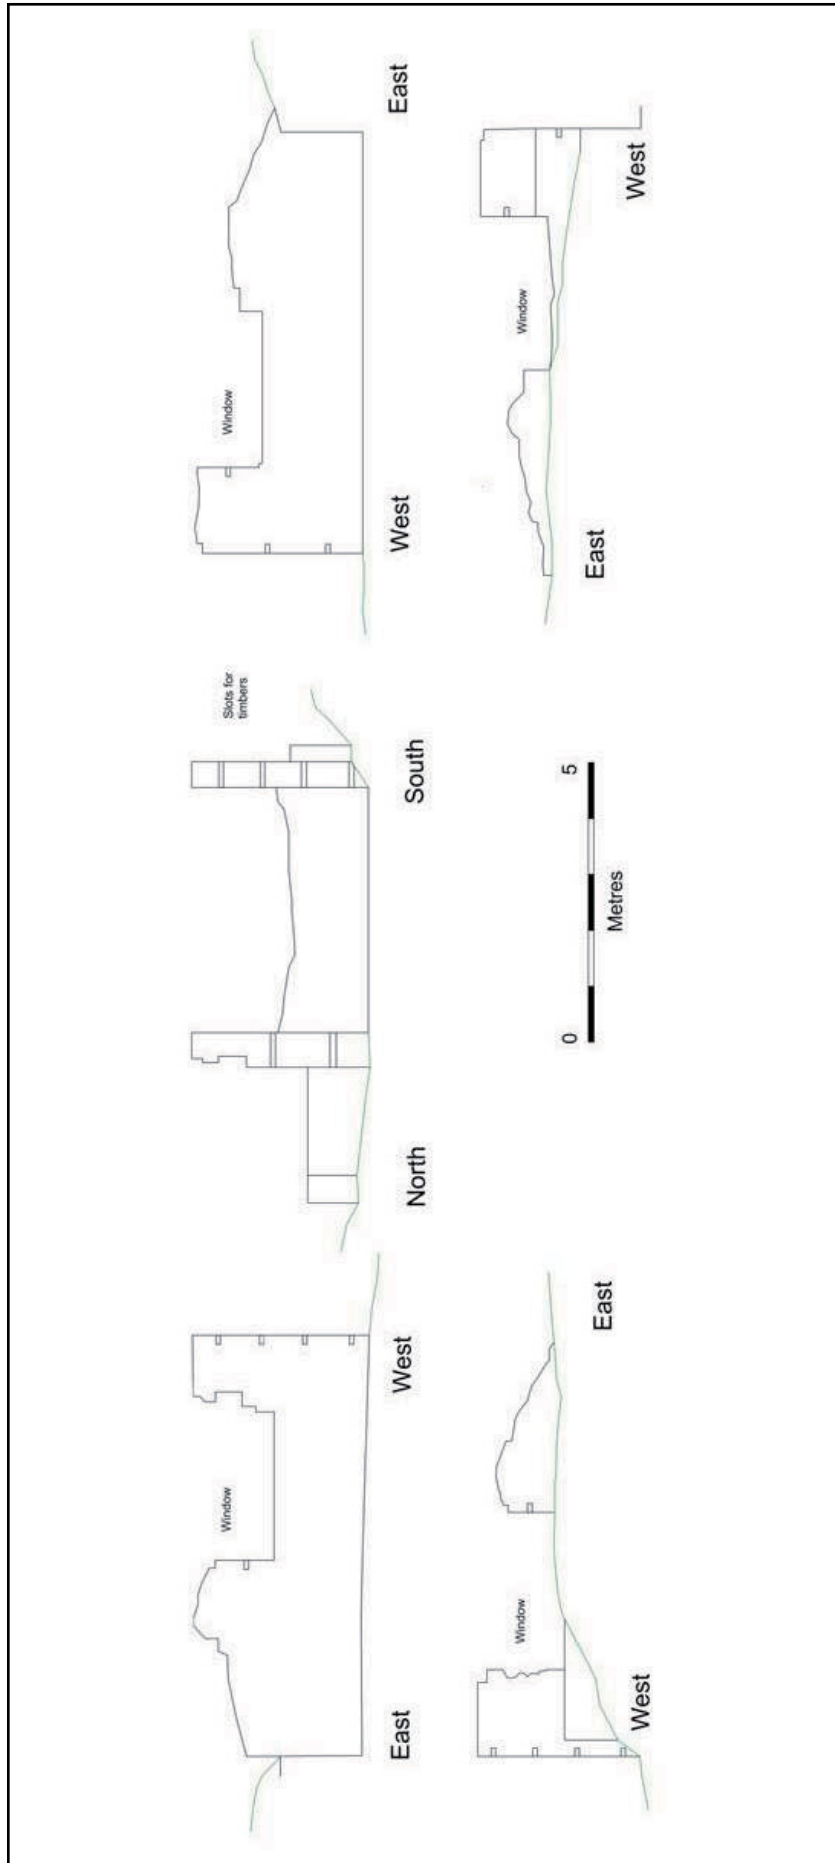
Wheal Coates gas engine house [190379] external and internal elevations.
